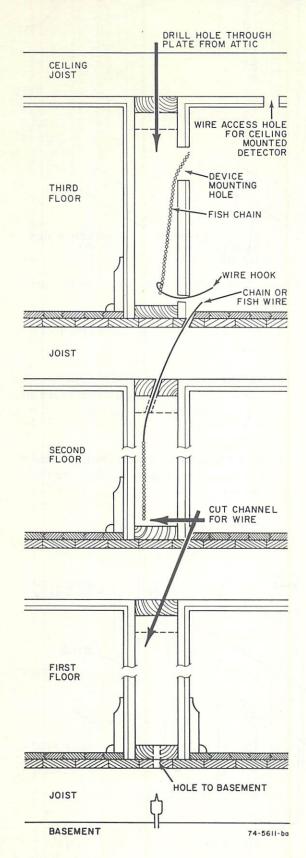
Running Wires Through Walls of Multi-Story Frame Buildings.
